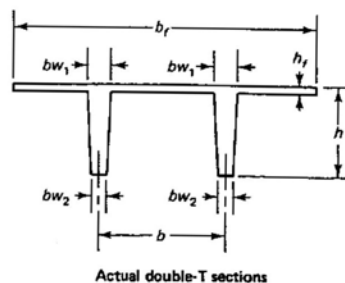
Section moduli of flanged and boxed sections (adapted from Ref. 4.16).
